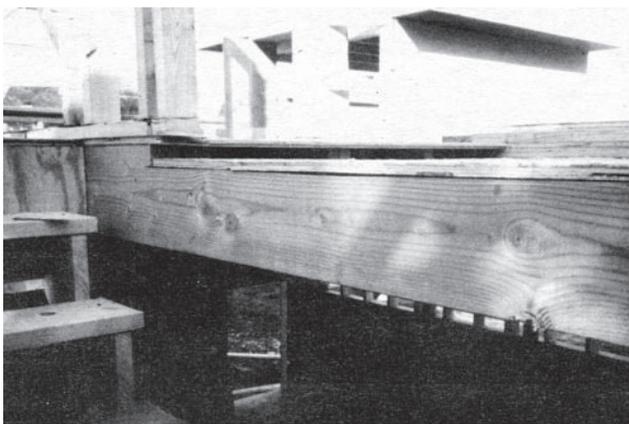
Interrupted joists must be headed off to transfer their loads to adjacent joists. If the header spans more than 4 feet, it must be doubled and the loads transferred to double trimmer joists.
